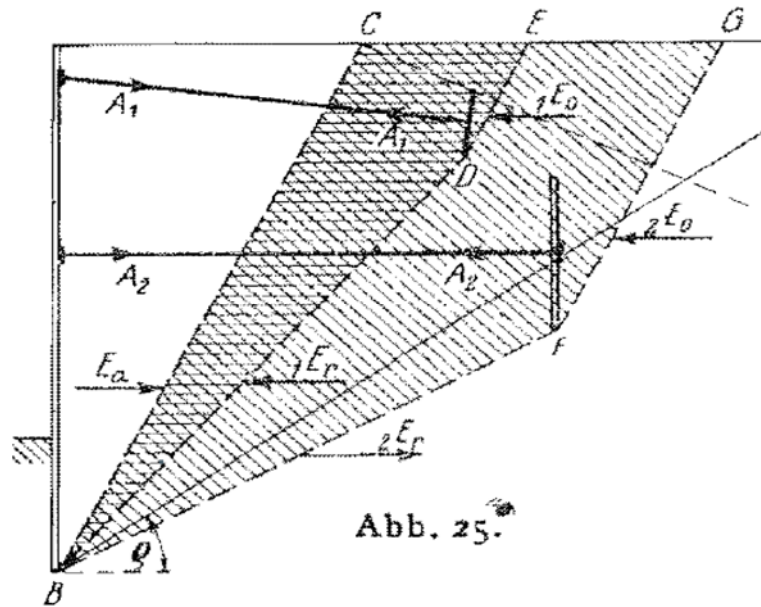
Example for a multiple anchored sheet pile wall with individual fixation [1]
